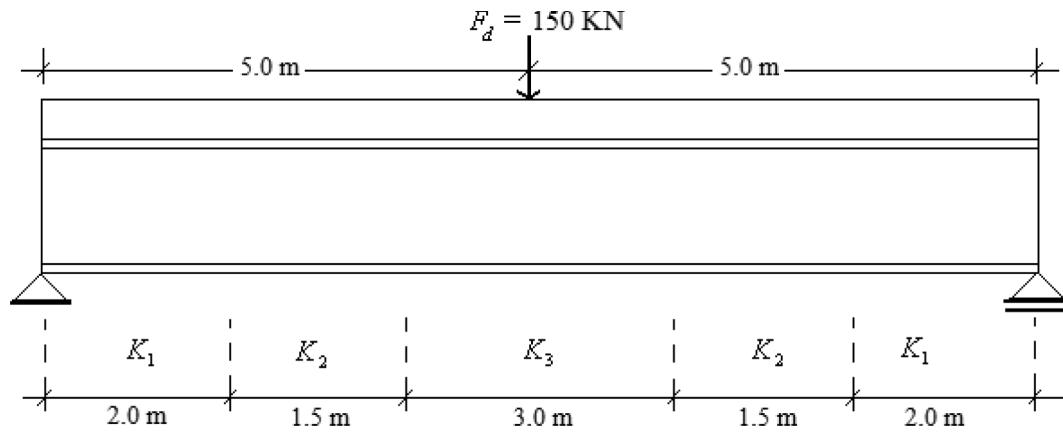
Stretches with the same longitudinal rigidity in the composite beam connections.
